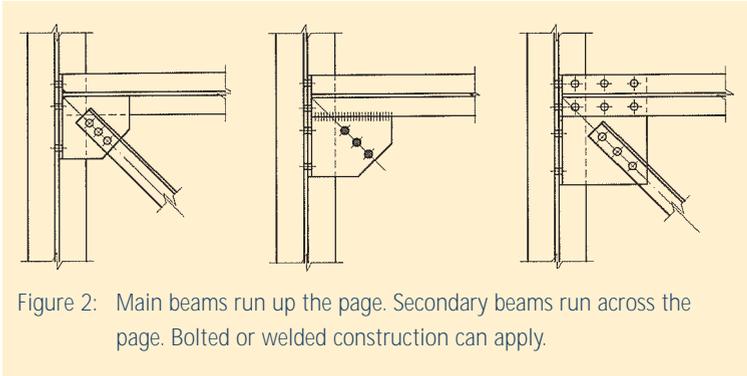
Main beams run up the page. Secondary beams run across the page. Bolted or welded construction can apply.
